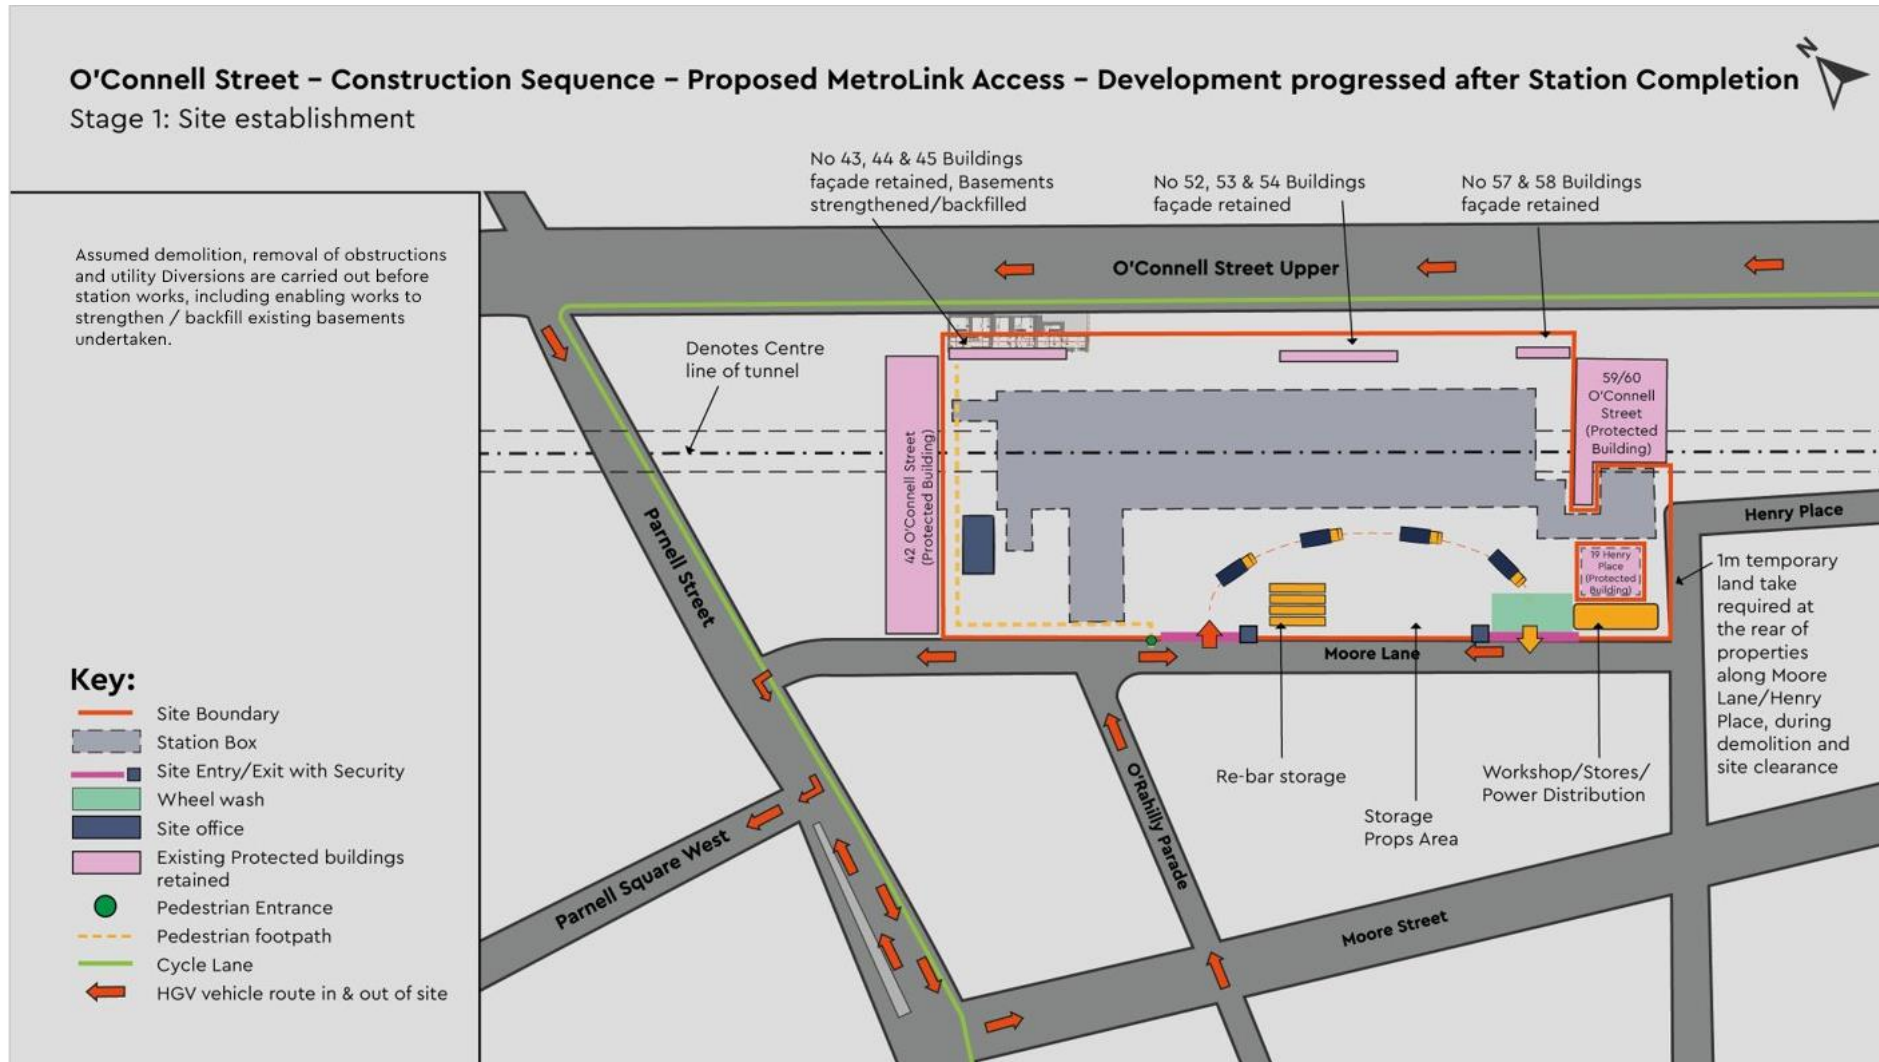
O'Connell Street Stage 1 – Site Establishment
